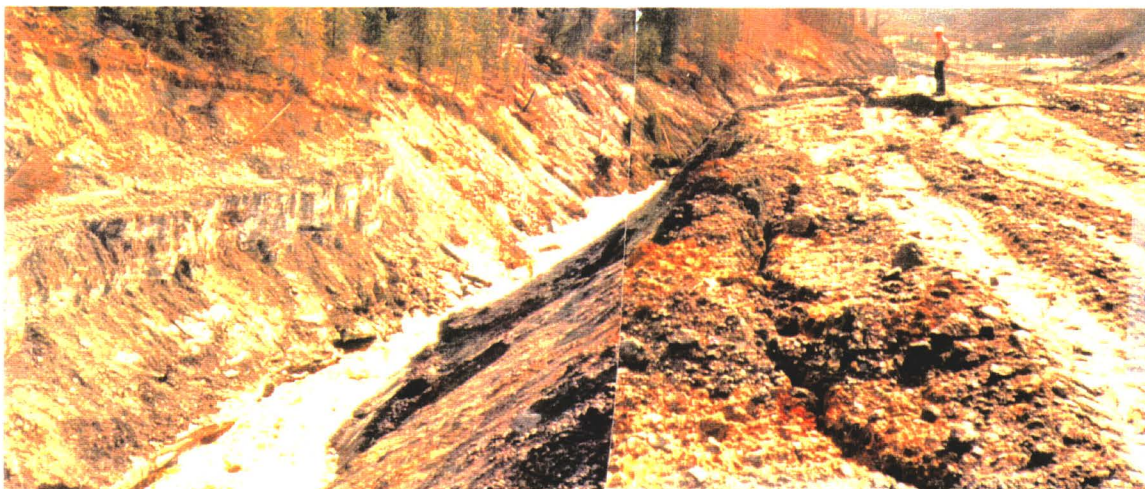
Erosion and Slumping of New Access Road on South Side of Creek (1976)
